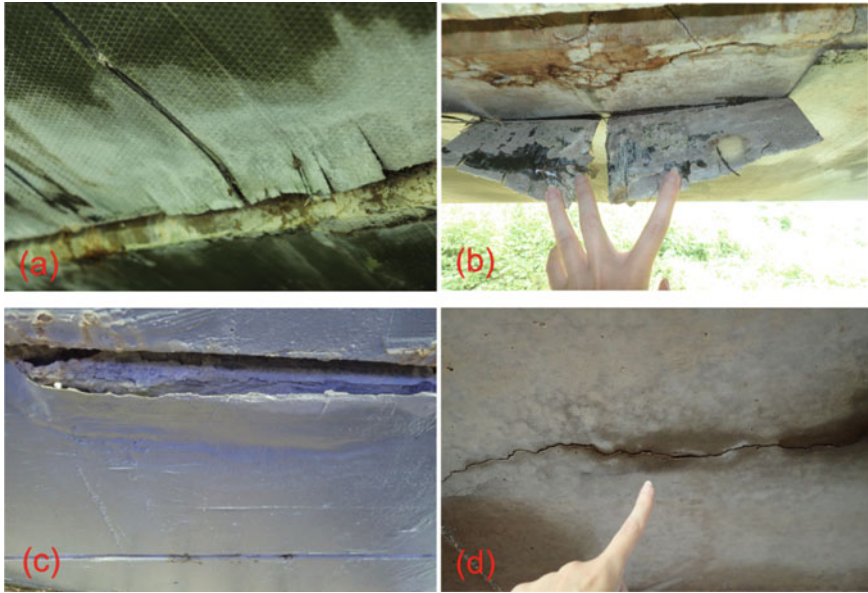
a Debonding, discoloration, and damage to the CFRP, b Debonding and damage to CFRP and concrete, and d Cracking of concrete girder G8
